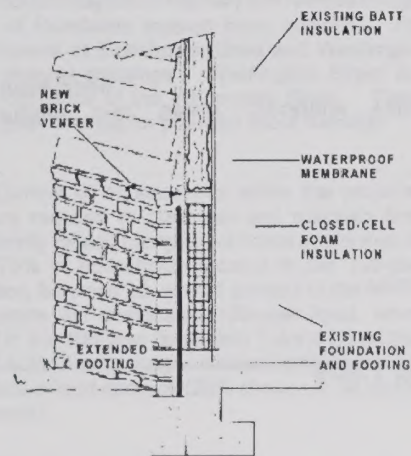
Adding Waterproof Veneer to Exterior Wall.
